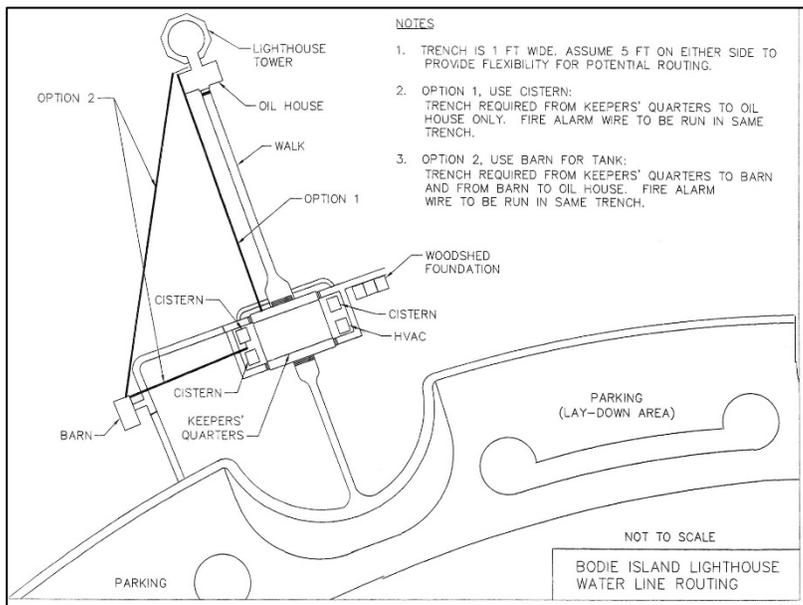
Water line routing plan that shows layout of walkways, c. 1992. (CAHA Collection)
